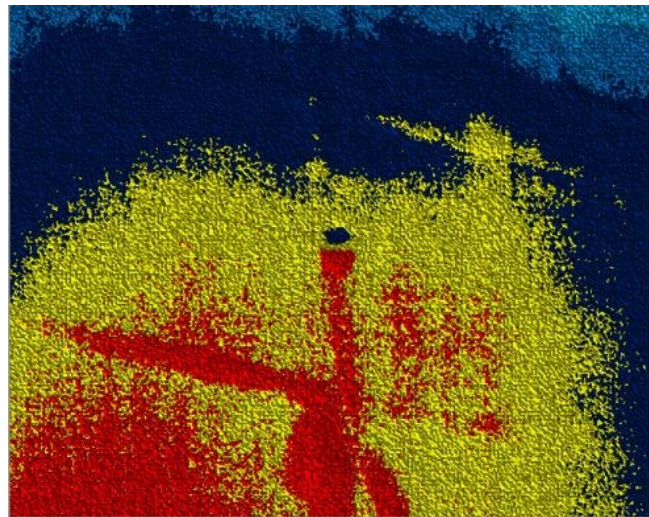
Photo at Location 1 (North Side of Wall 2)
